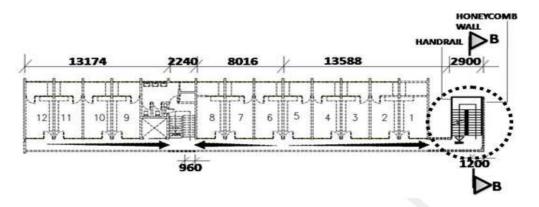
Typical plan showing fire escape stair attached to existing blocks
